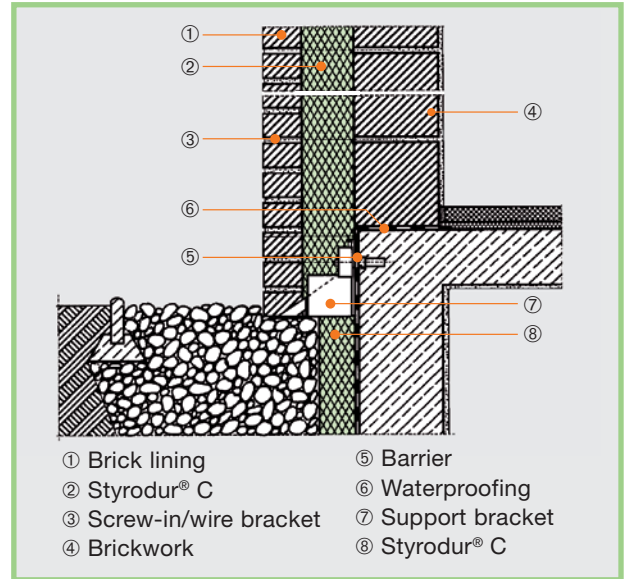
Connection of the perimeter insulation to brickwork with core insulation with support brackets.
